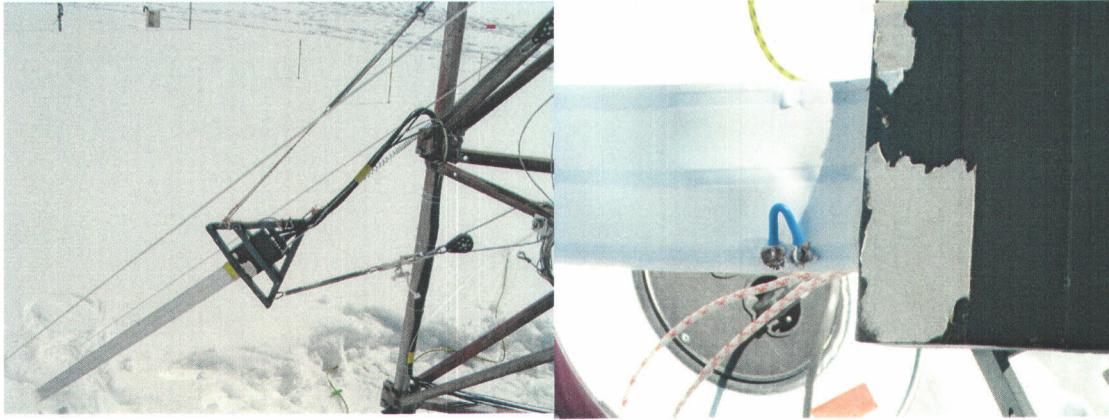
Installed cable at Swiss test site and repair of broken conductor
